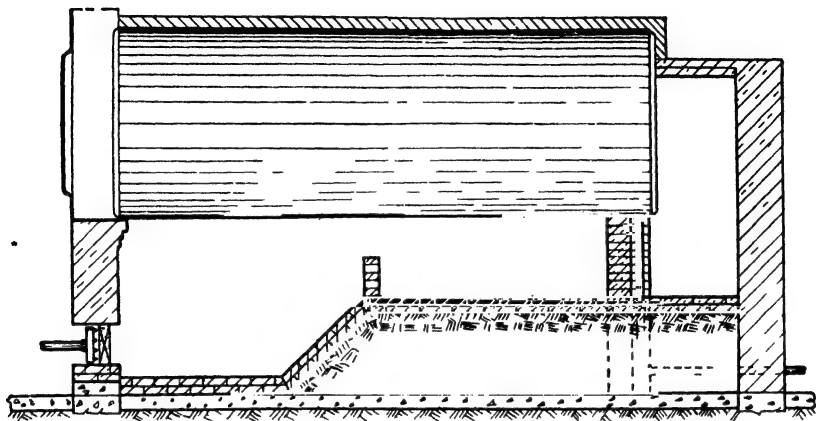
Horizontal return-flow fire-tube boiler (stack at front) (Courtesy of Webster Engineering Company)
